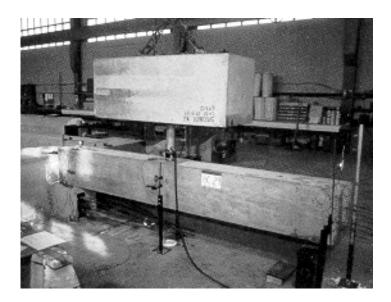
Testing of Grouted Duct Connection [1.32]
